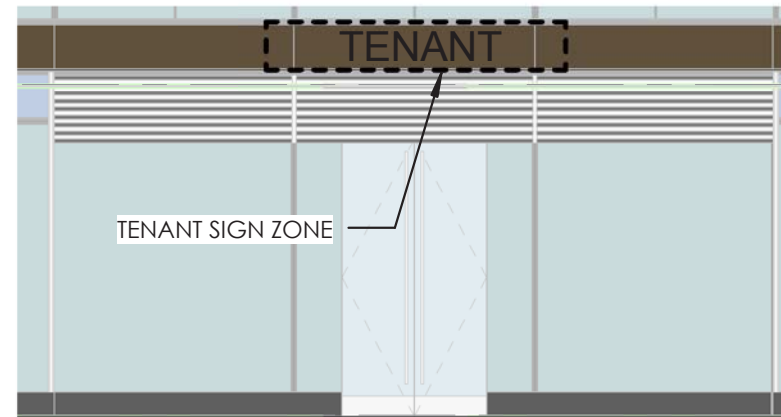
21ST STREET TYPICAL RETAIL
